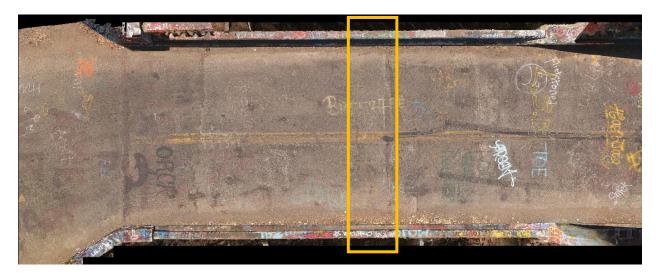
Location of crack between Abutment 1 and Pier 2 as shown through UAS image
